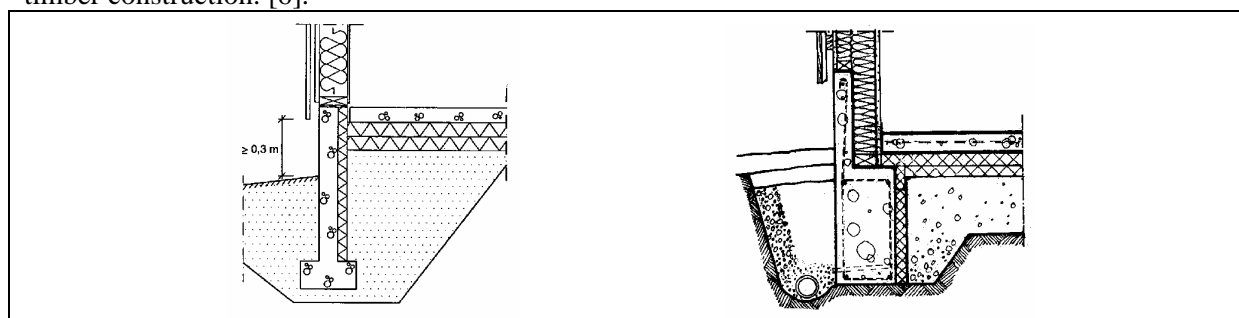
Left. A safe joint of the floor and the exterior wall. Right. A dangerous solution from the 1970s. The floor and the ground are on the same level.
